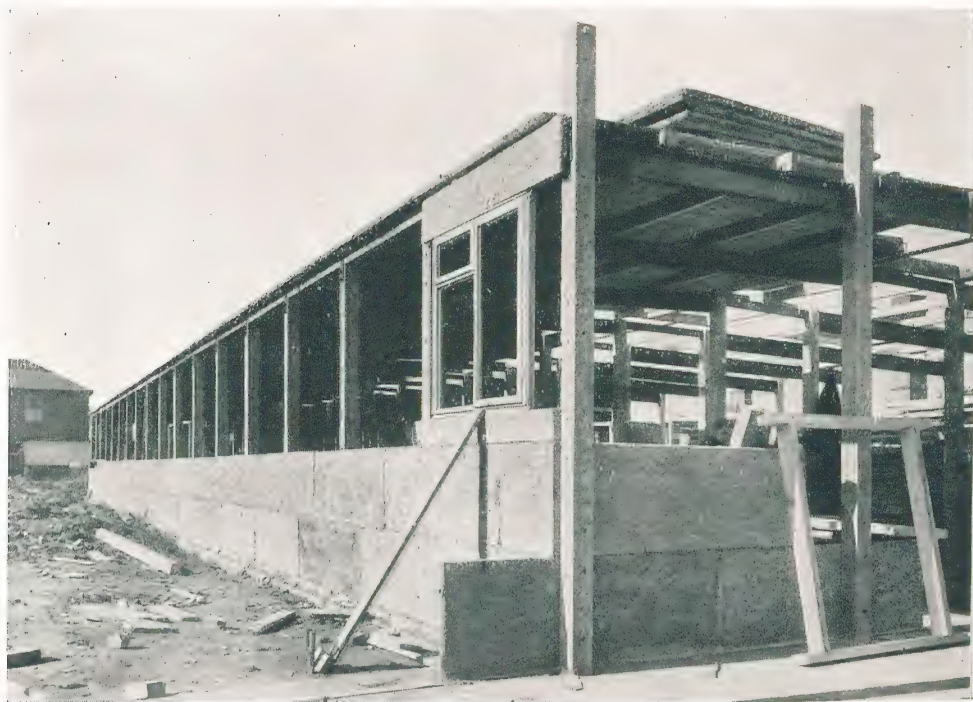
GYPKLITH LIGHT-WEIGHT BUILDING SLABS AS APPLIED TO EXTERNAL SLAB CONSTRUCTION.
